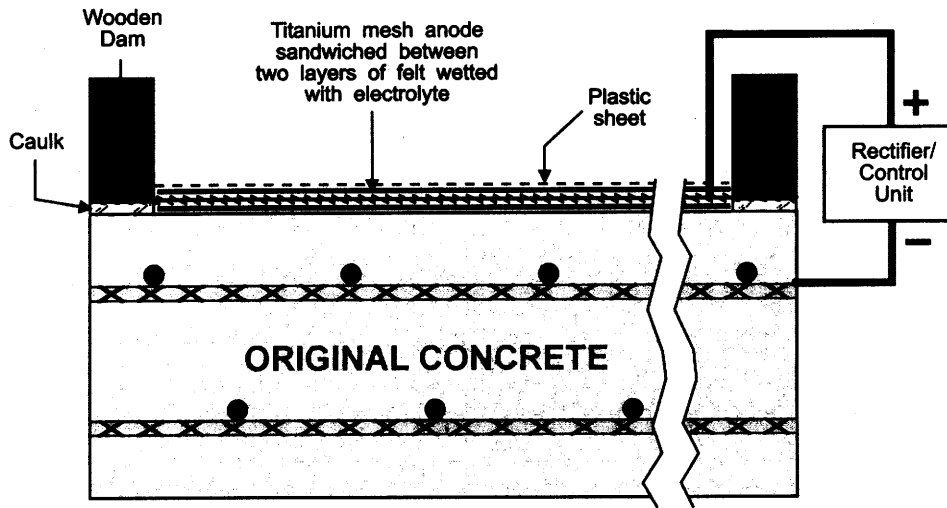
Illustration of ECE setup on the 34th Street Bridge in Arlington, Virginia, USA <sup>[17]</sup>
